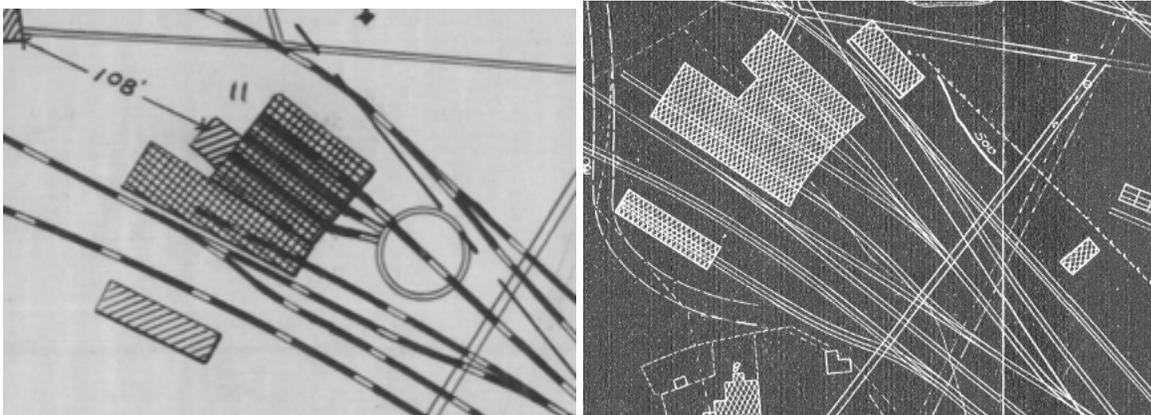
45: Partial plan view dated October 1902 (left) and an undated partial plan (right) show the removal of a turntable and changes in railroad track layout. (Images courtesy of Michigan Technological University Archives & Copper Country Historical Collections)
